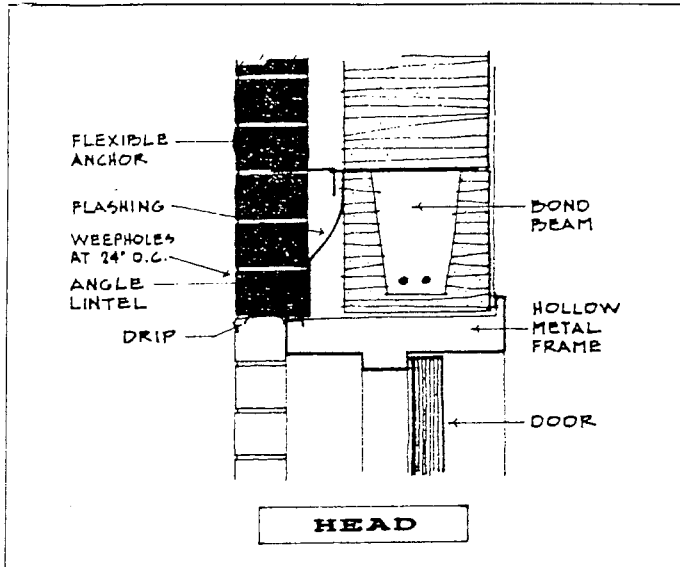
Also install flashing above window and door lintels. Set the windows and doors back from the wall face so less rain reaches the joint between the lintel and head of opening.
